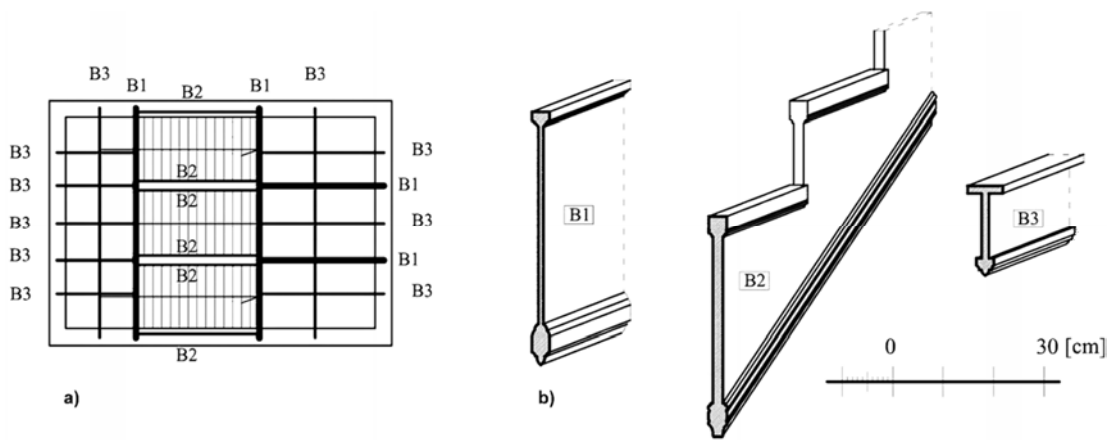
Cast iron staircase, stocktaking: (a) scheme of construction layout, B1, B2, B3 – types of beams; (b) types of beams.
